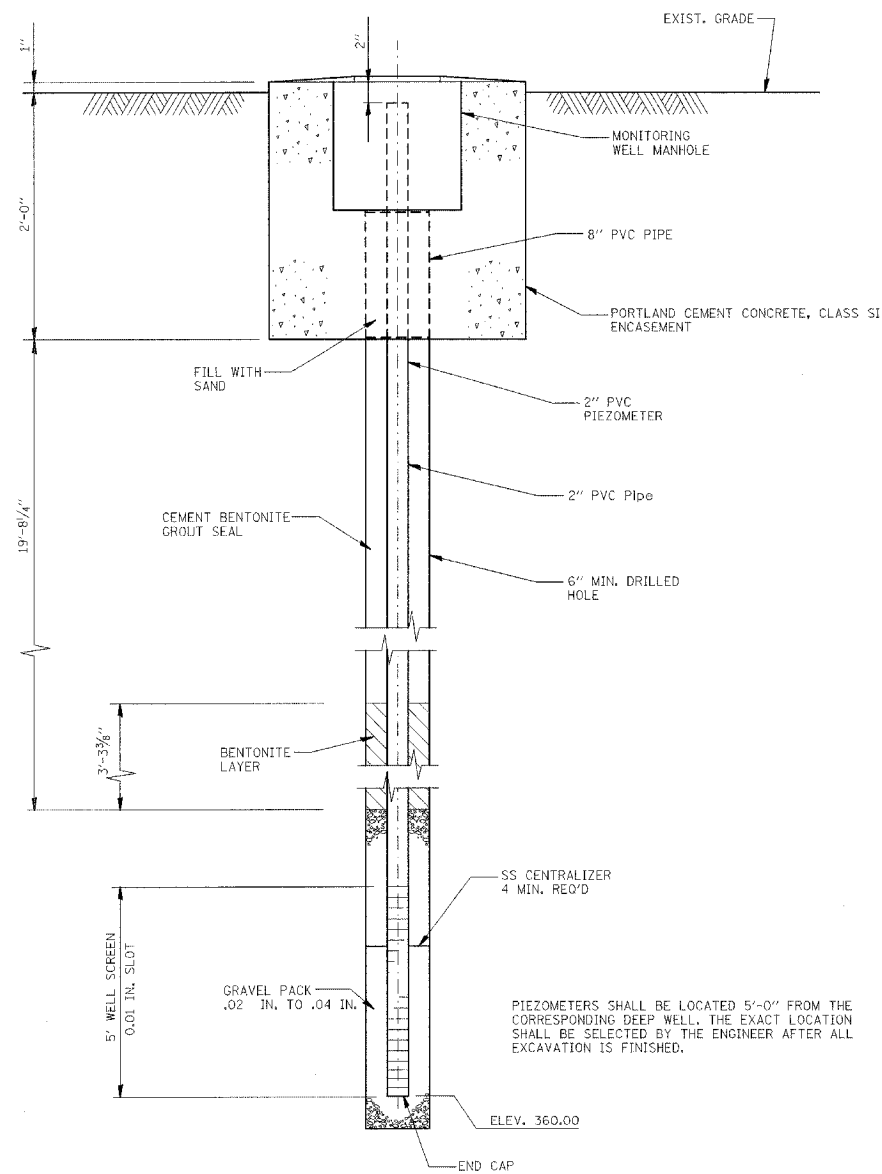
DETAIL OF EXIST. DRAINAGE WELL PIEZOMETER
